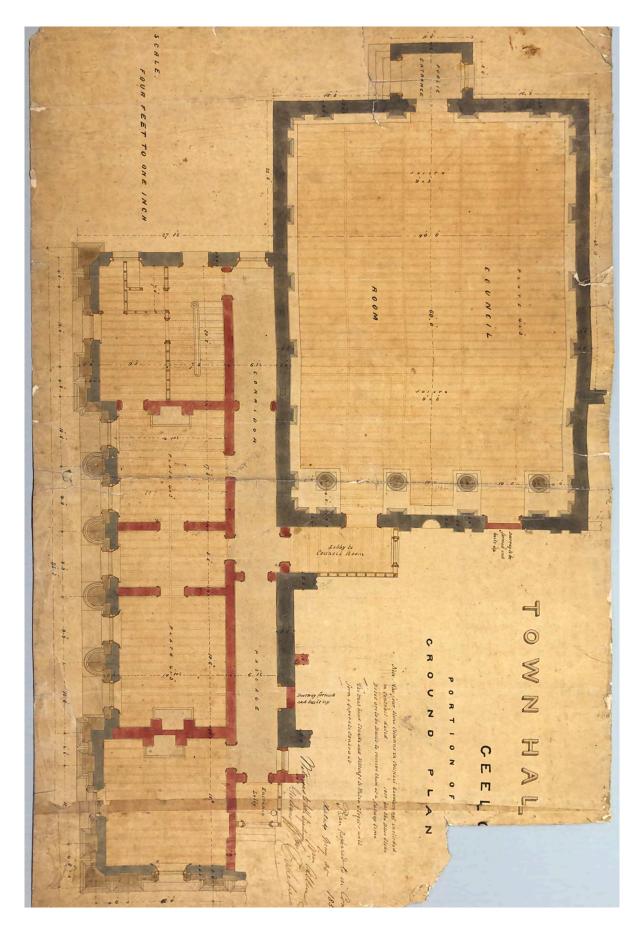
Original architectural drawing of ground floor showing sections that were constructed in 1855. North is to the right of the image (A156, GRS 2031 Geelong Council Plans, Geelong Heritage Centre)
